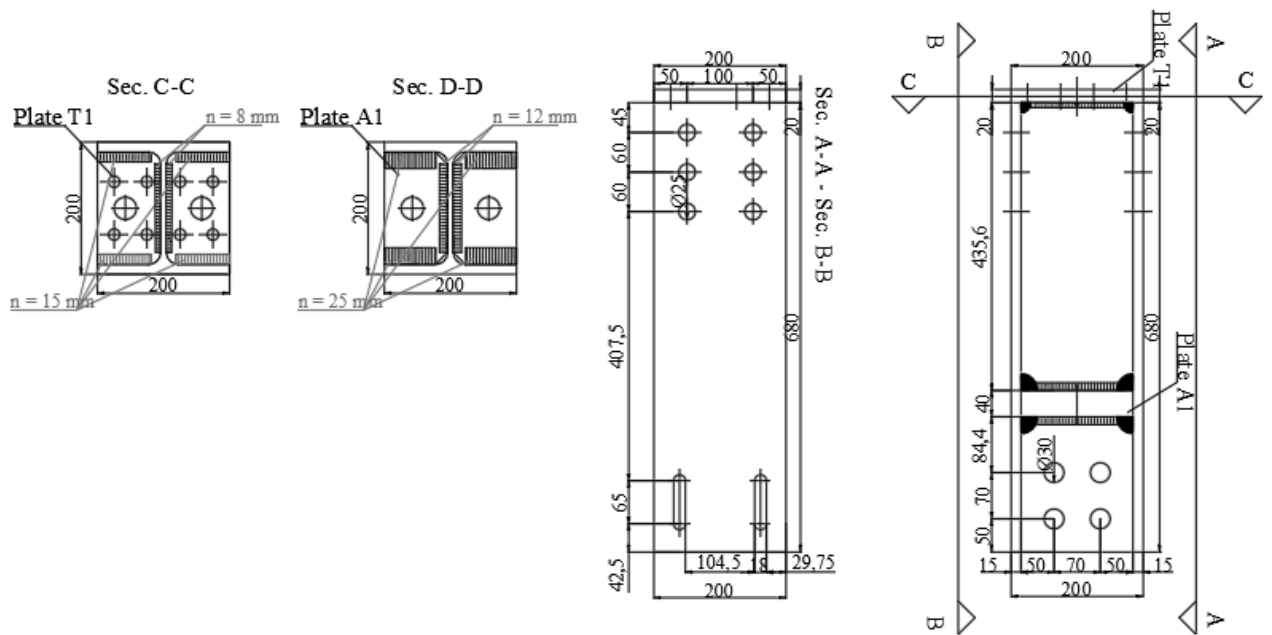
Upper part of the SC-CB (dimensions in mm)
